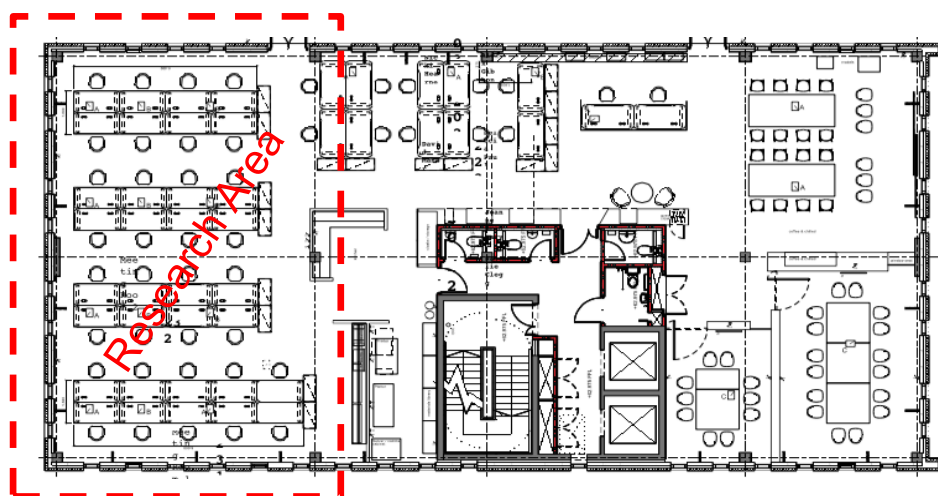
5 Plus Architects Workplace Layout – Manchester (UK)
